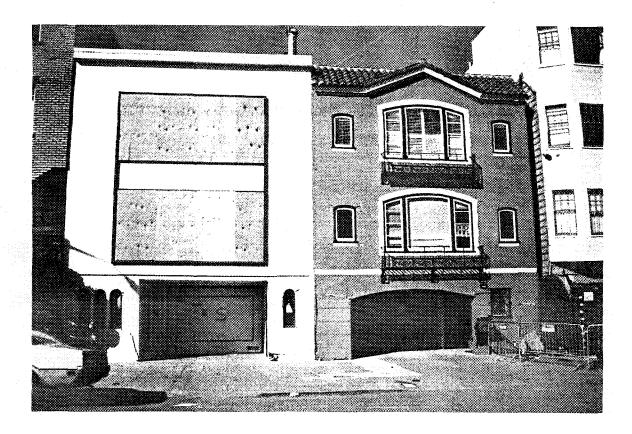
Large openings (garage doors or windows) invoked some damage in 2-storey buildings in Marina District, San Francisco. Note the shift of the adjacent corner 4-storey building
